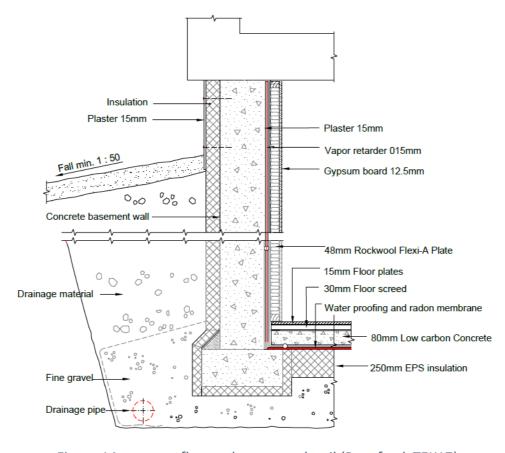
concrete floor at basement detail (Byggforsk TEK17)
